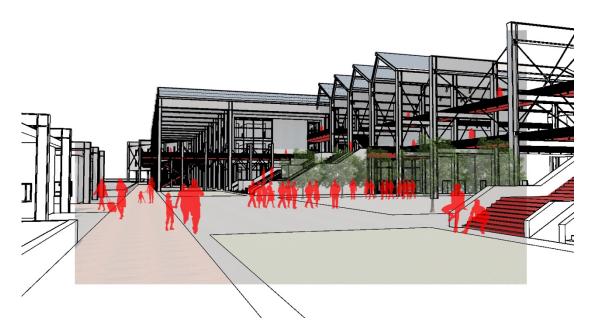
Outdoor Cinema Entrance near Ferry Dock (Source: Author)
